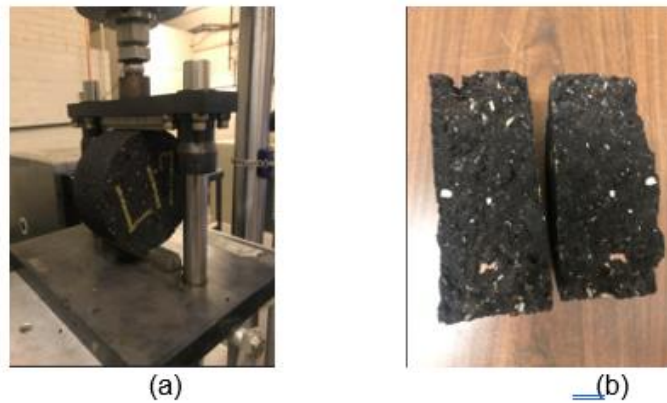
IDEAL-CT test on asphalt specimen for cracking resistance of asphalt mixes: (a) test setup and (b) specimen after test
